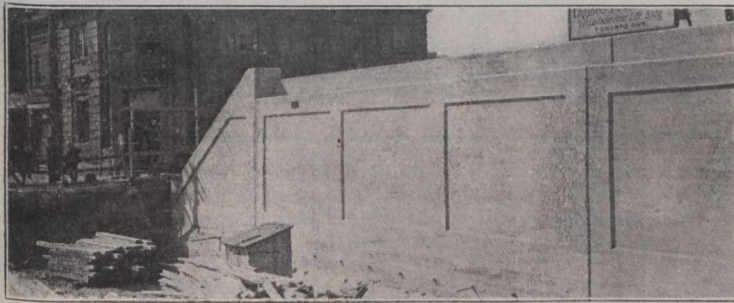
West Abutment Wall of Yonge Street Subway.
